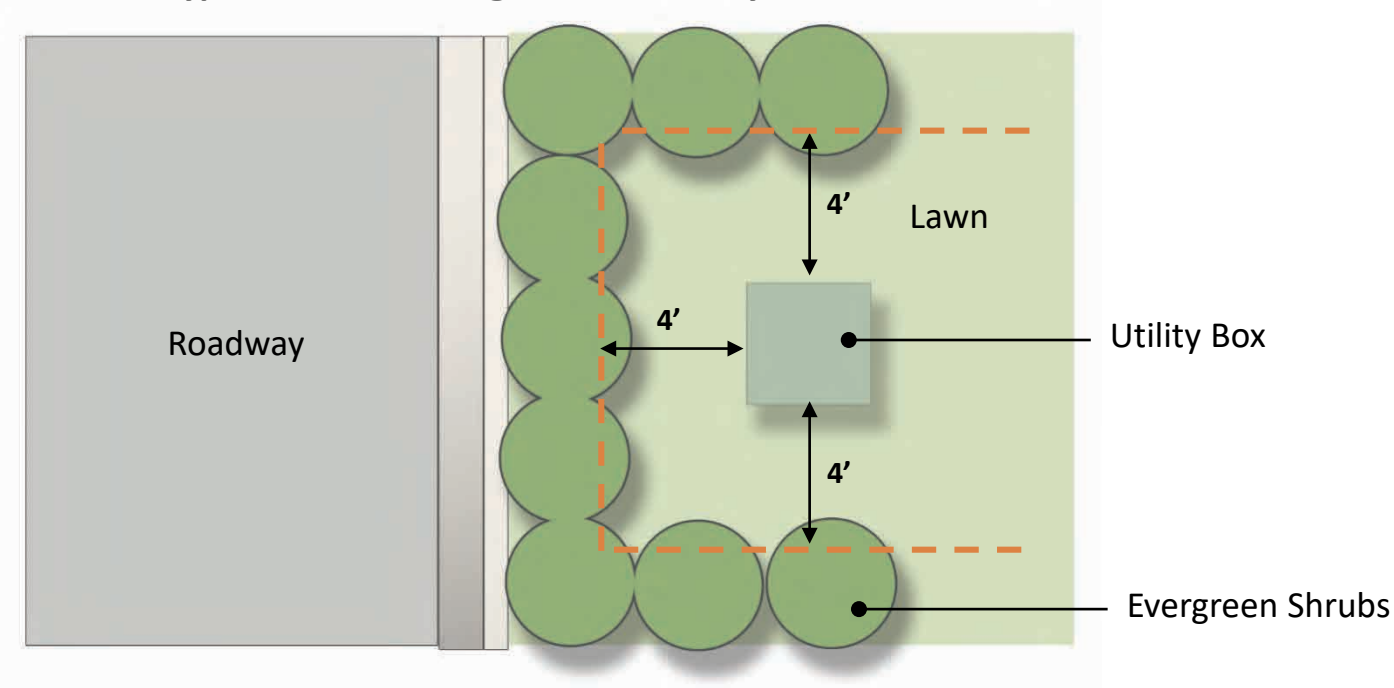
Typical Shrub Planting to Screen Utility Infrastructure, Plan View
